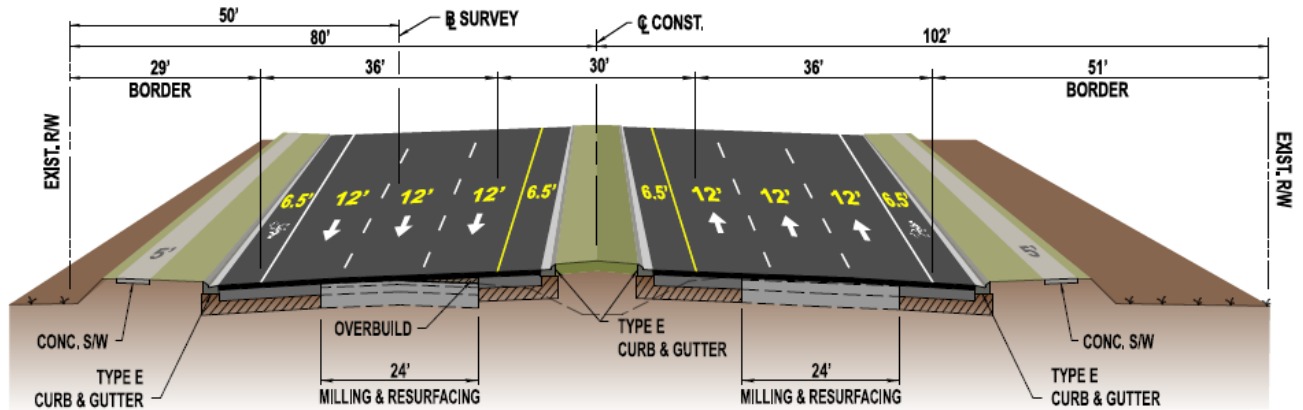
URBAN NEW CONSTRUCTION TYPICAL SECTION
